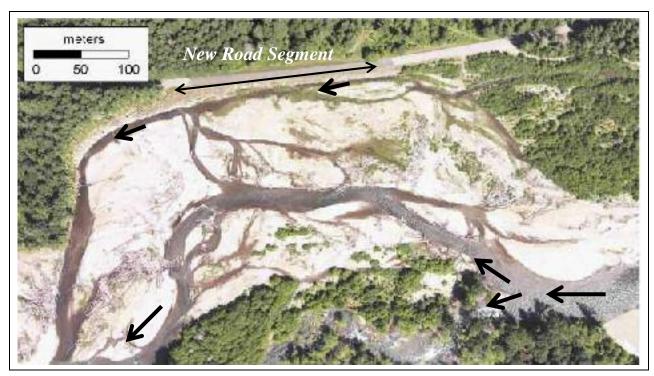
Site B on Cispus River in 1999 before ELJ construction where 150-meter road segment was washed out in 1996.
